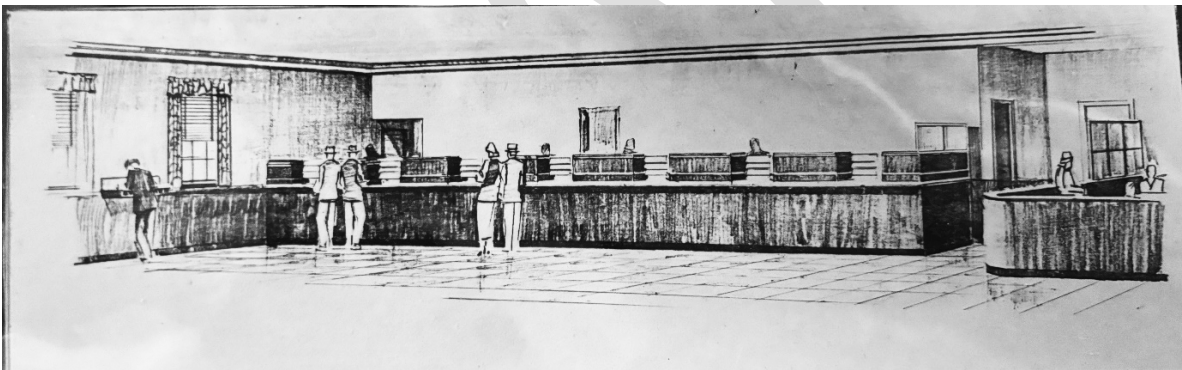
Interior rendering of 1952 expansion showing new “barrier-free” counter along south wall of new addition. Hoggson Brothers.
